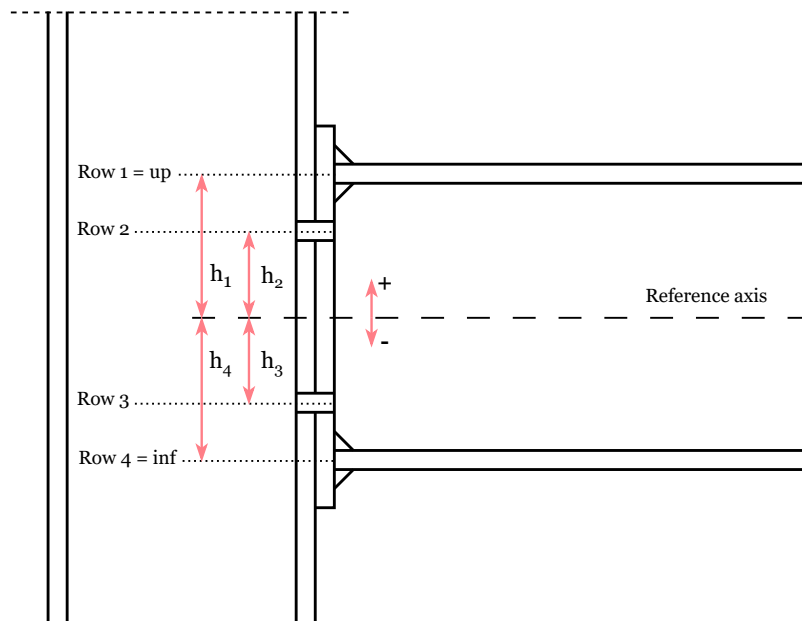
Illustration of the lever arms of a typical beam-to-column joint
